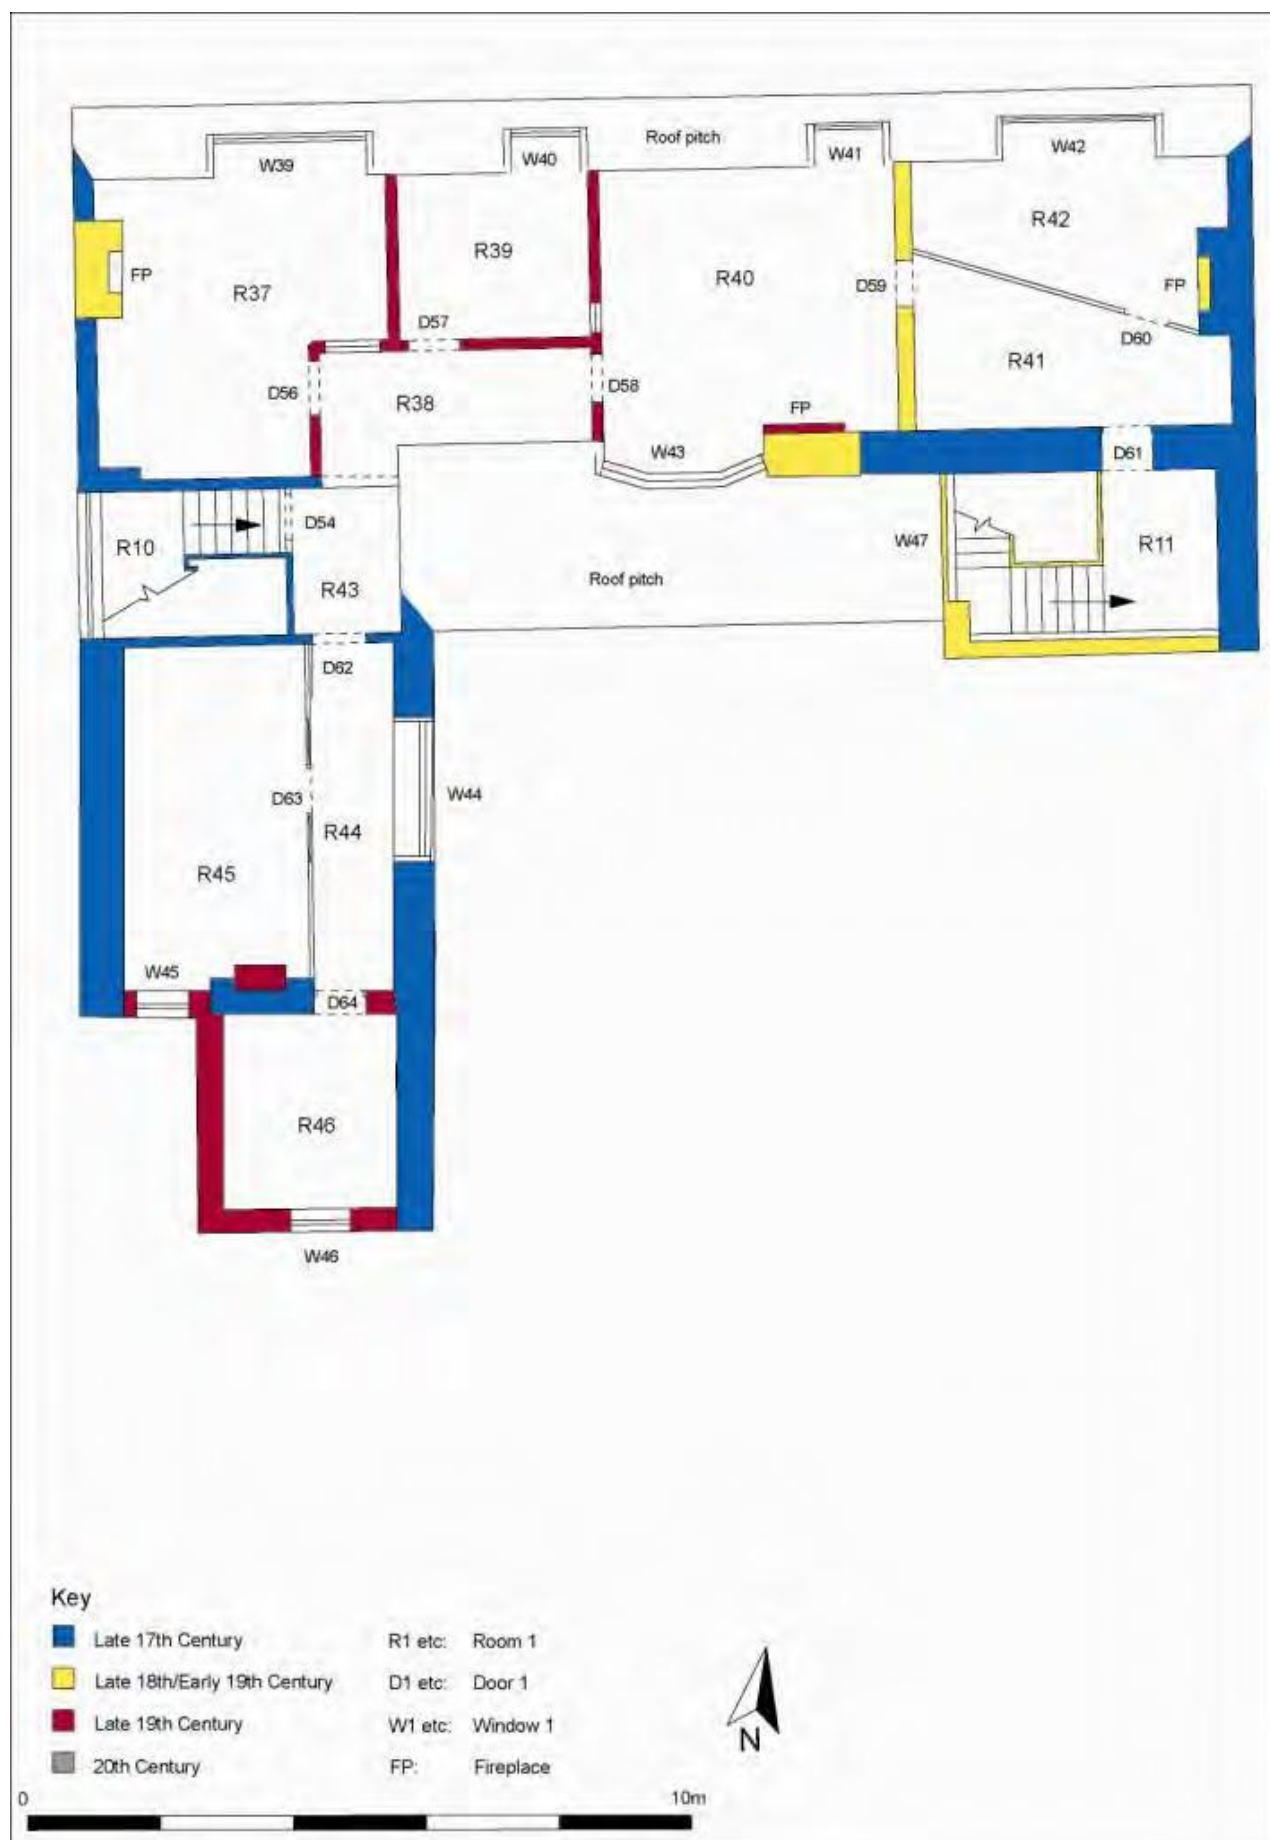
Phased second floor plan of 28 Bridgeland Street.
